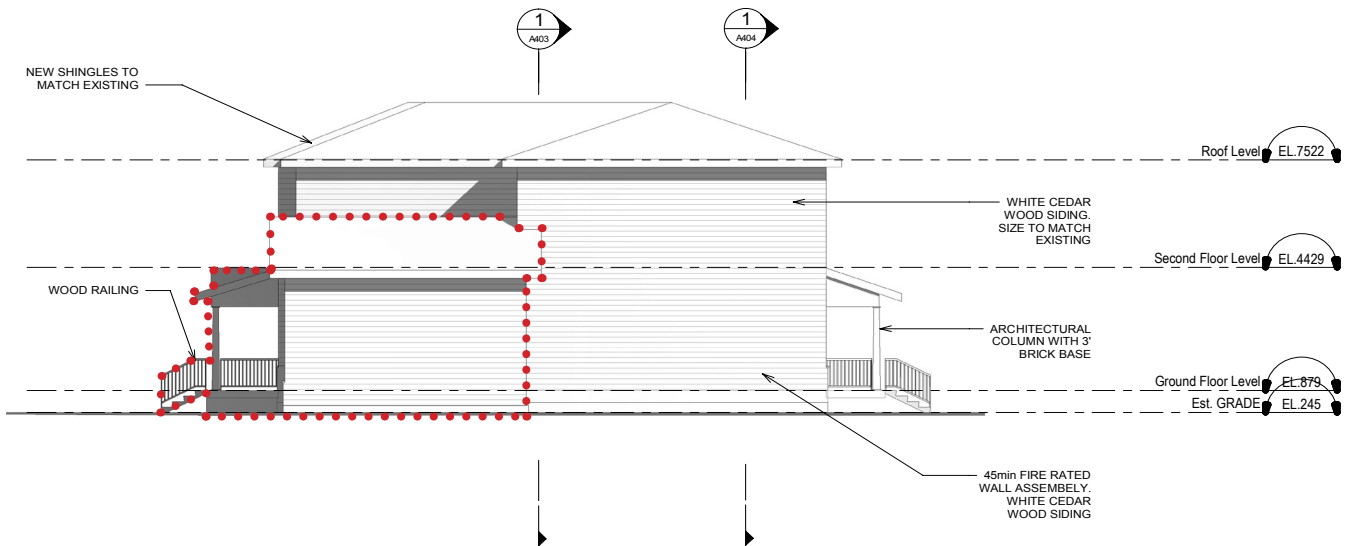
East Elevation. Red dotted line indicates outline of existing garage and front porch (beyond) to be incorporated into proposed addition/renovation. Drawing by Third Layer Architects, 2021.
